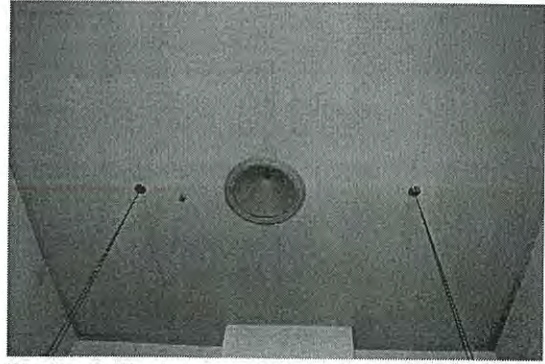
Interior, Office (spaces FF04/05). Detail of introduced strapped sheet ceiling and original ceiling vent with galvanised hood.
